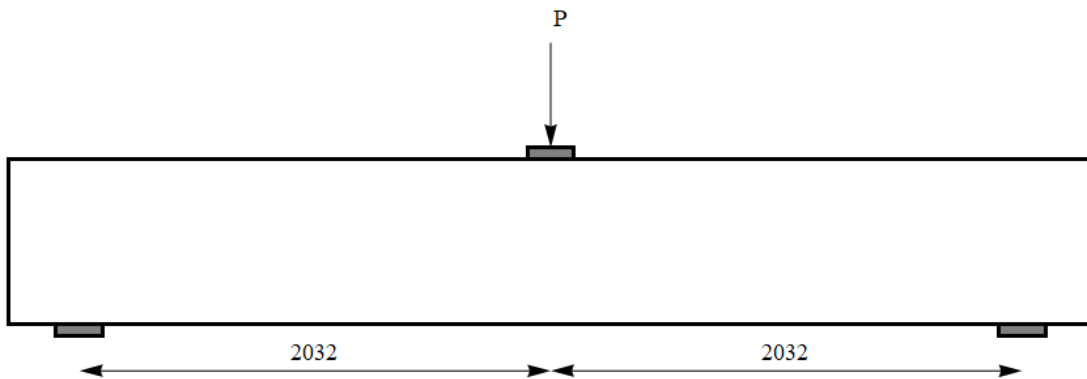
Beam test setup for simply supported rectangular beam [80].
